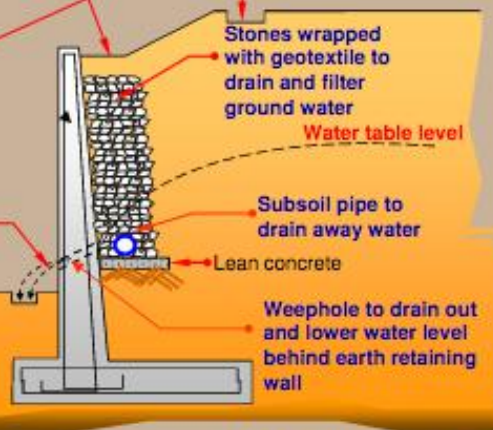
Typical Cross Section of RC Earth Retaining Wall
